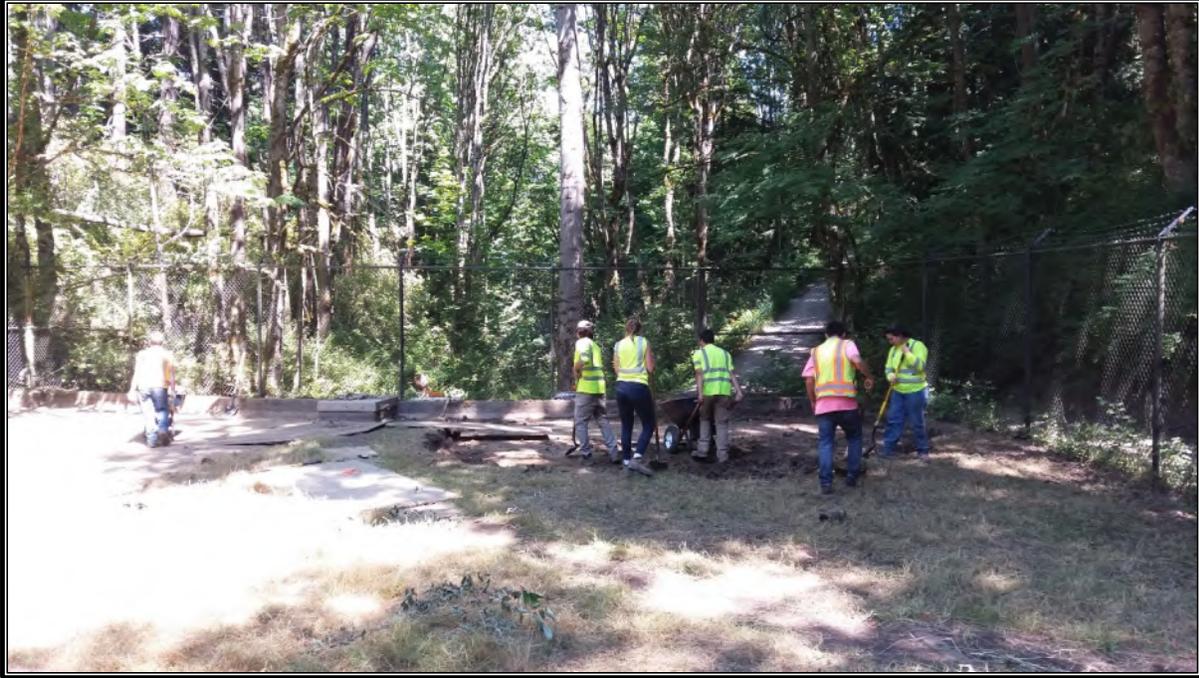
Sehome Reservoir – Work crews clearing the soil load from the roof in 2017 (picture provided by the City of Bellingham)
